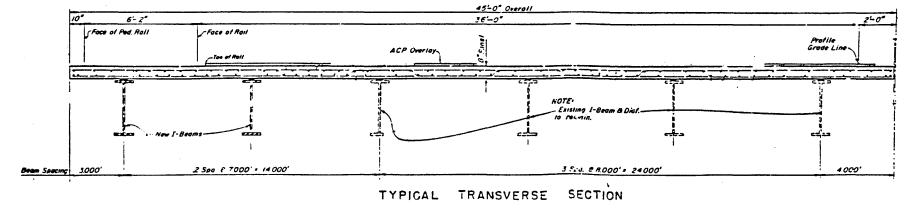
Typical Transverse Cross Section of Precast Decked Span.
